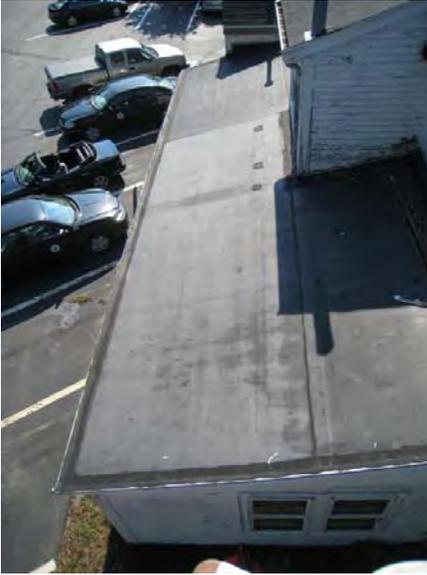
EPDM roof at first floor shed roof of east ell.
